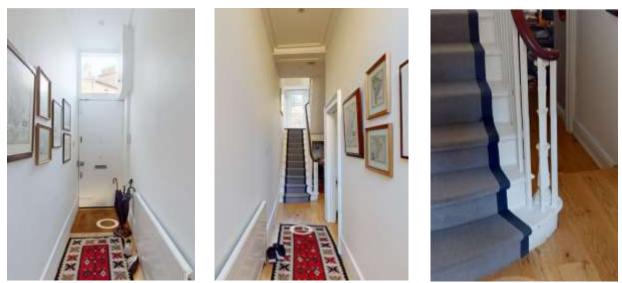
& 22 - View of the entrance hall and the stairs; note downlighters in the ceiling Figure 23 – Timber stair with newel post on the curved first step.
